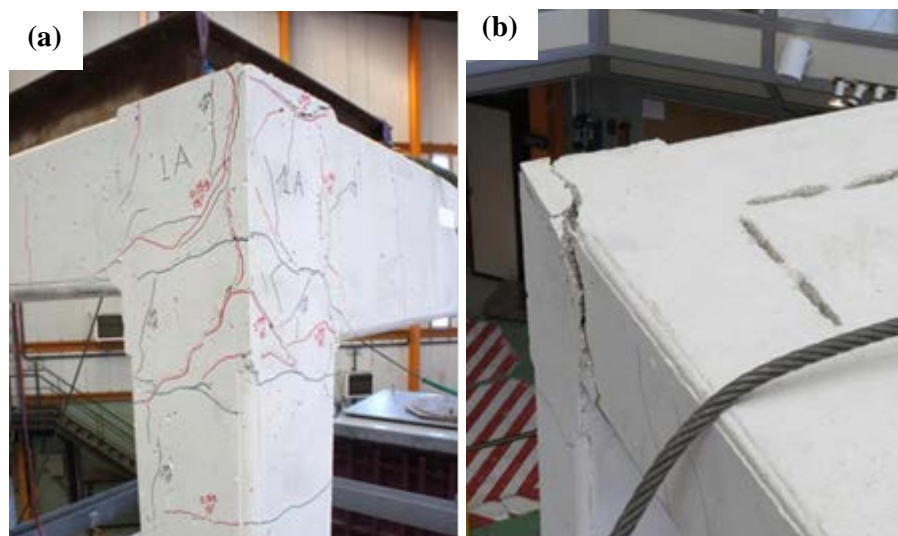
Damage at the 2nd floor joints (a) joint 1A-2 and (b) joint 2A-2.
